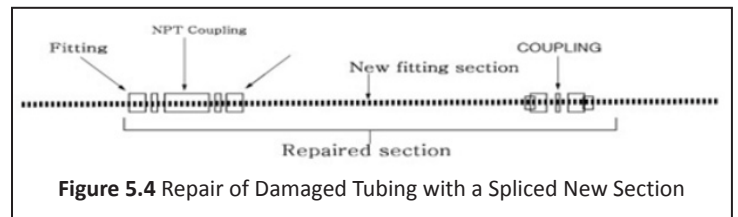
Repair of Damaged Tubing with a Spliced New Section
